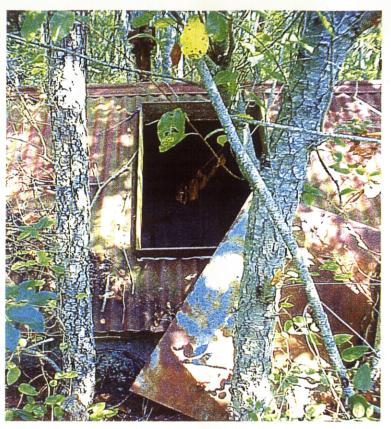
Site 3 – Two 600,000-Gallon Fuel Tanks – Site Conditions Photograph Wallops Flight Facility, Accomack County, Virginia
